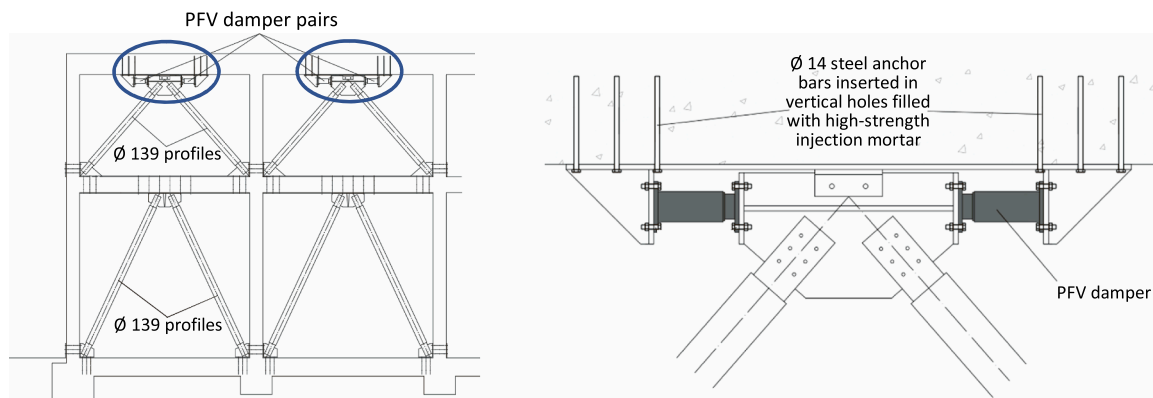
Installation scheme of the dissipative bracing system and detail of a connection to the RC structure.
